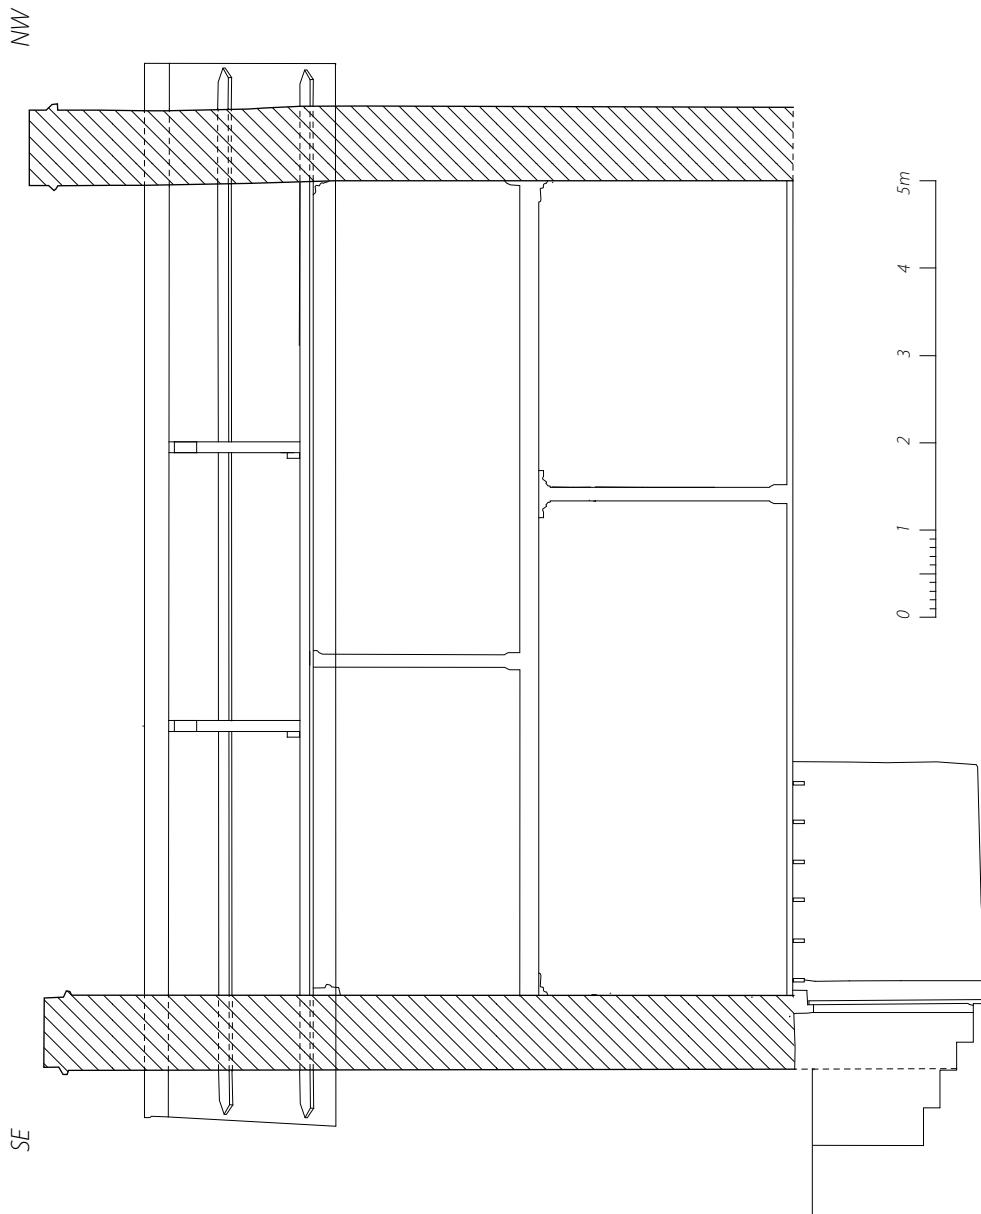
Western cross section through elevation of Egryn house 19th century parlour wing
